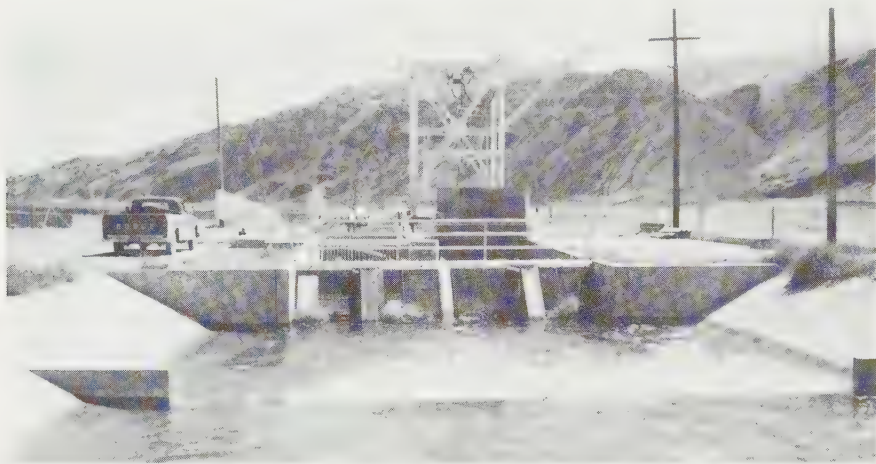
Priest Rapids spawning channel fish-sorting facilities.
